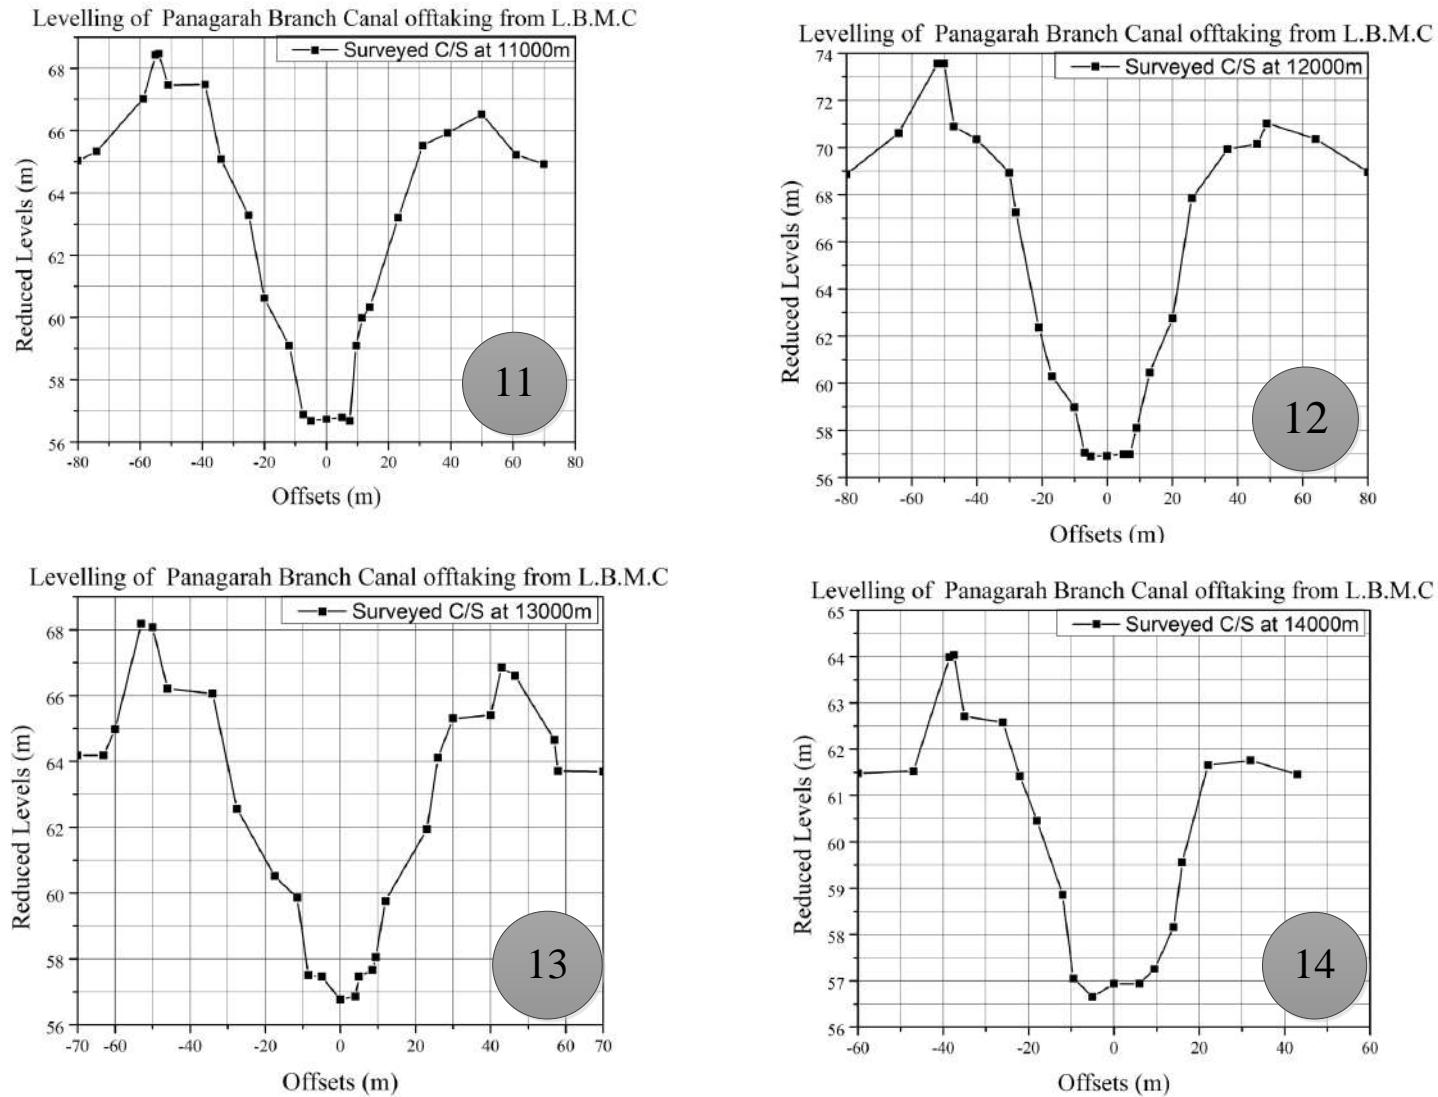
Canal cross section from 11 km to 14 km on Panagarh branch canal
